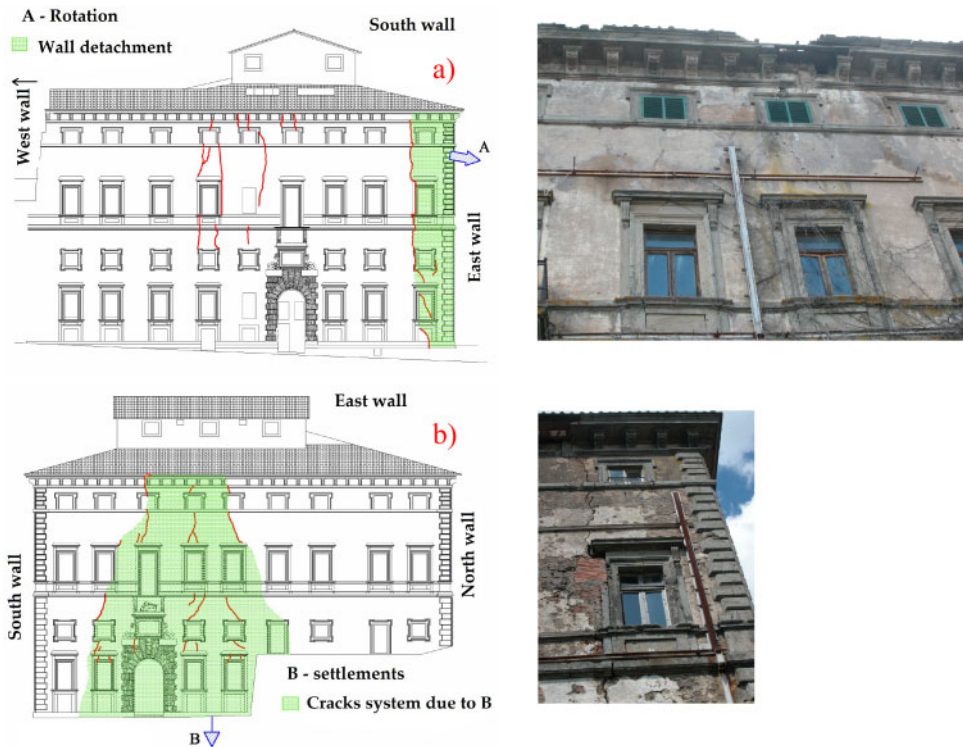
The actual crack systems: (a) East wall; (b) South wall (from Picchioni 2008).
